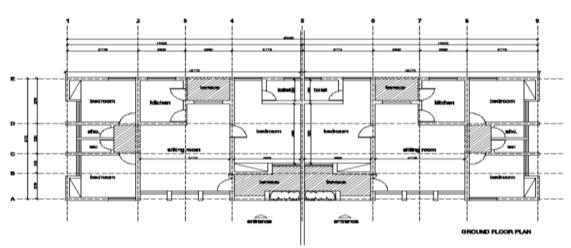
Typical Floor Plan of a fully developed twin-3-bedroom dwelling unit per plots of 540 m<sup>2</sup>
